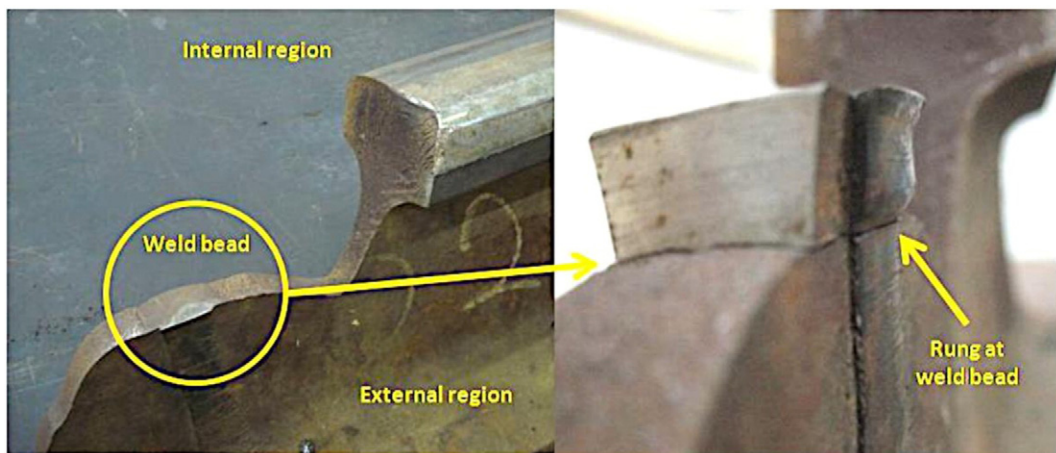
Rail fracture surface, highlighting a rung at the welded bead.
